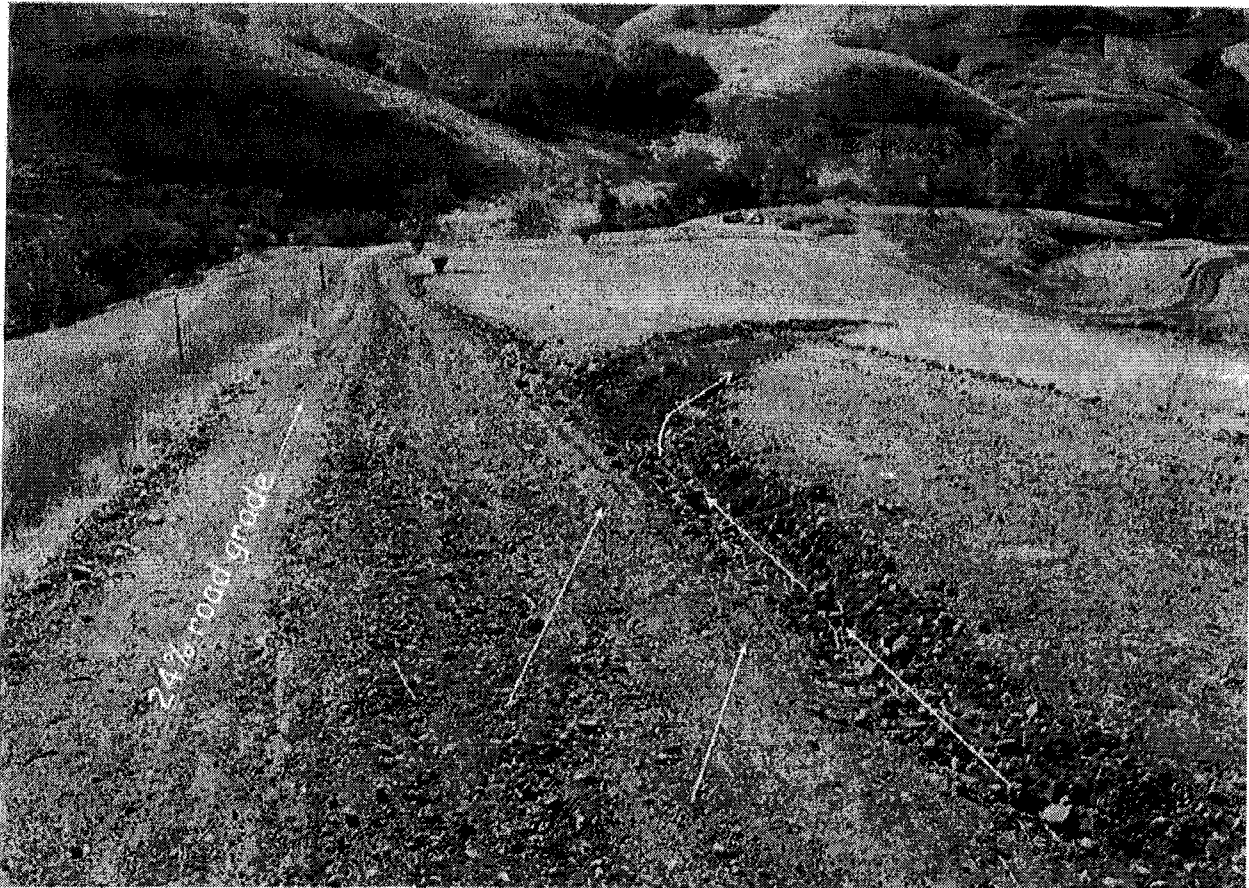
Steep roads that go straight up or down a hillside are very difficult to drain. This steep, fall line road developed a through cut cross section that was drained using lead out ditches to direct runoff off the road and onto the adjacent, vegetated hillside. The road was "outsloped" to drain runoff to the right side, and the lead out ditch was built slightly steeper than the road grade, to be self-cleaning. Four lead out ditches have been constructed at 100-foot intervals to the bottom of the hillside.
